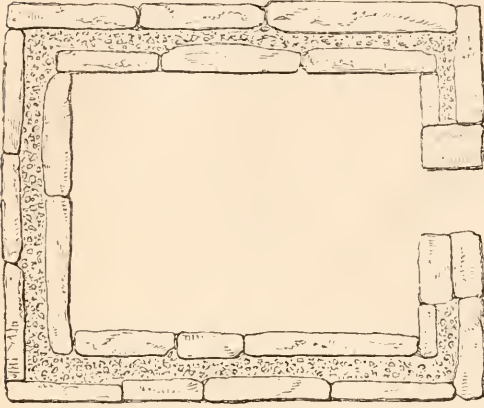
Ground plan of a small Cyclopean Church, showing the doorway in the east wall, the long stones, placed on edge, forming the inside and outside of the walls (3 feet thick) with rubble and grouting inside.
